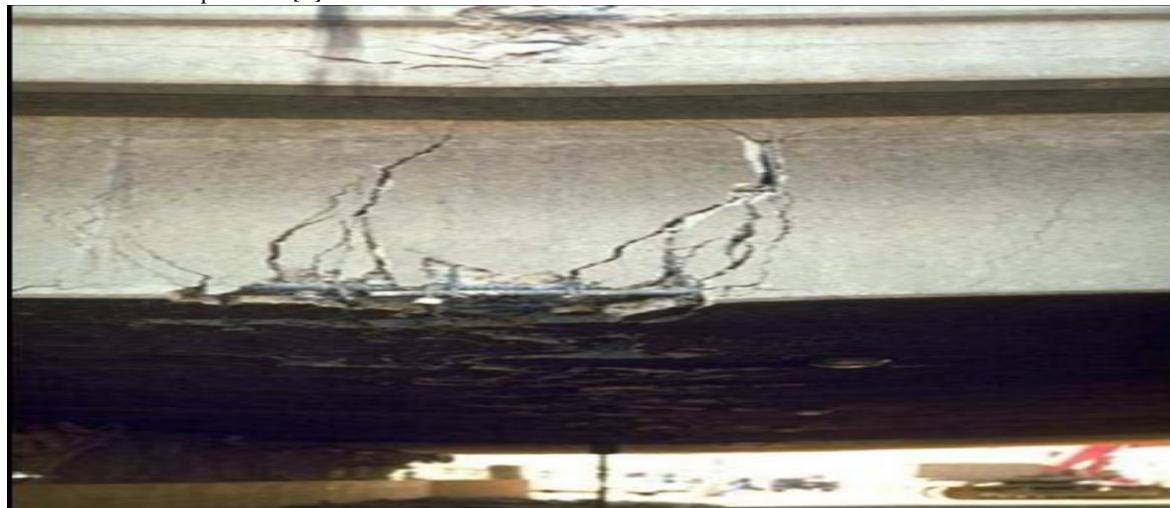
Splitting failure of beams at lap splices of tensional steel bars [6]
